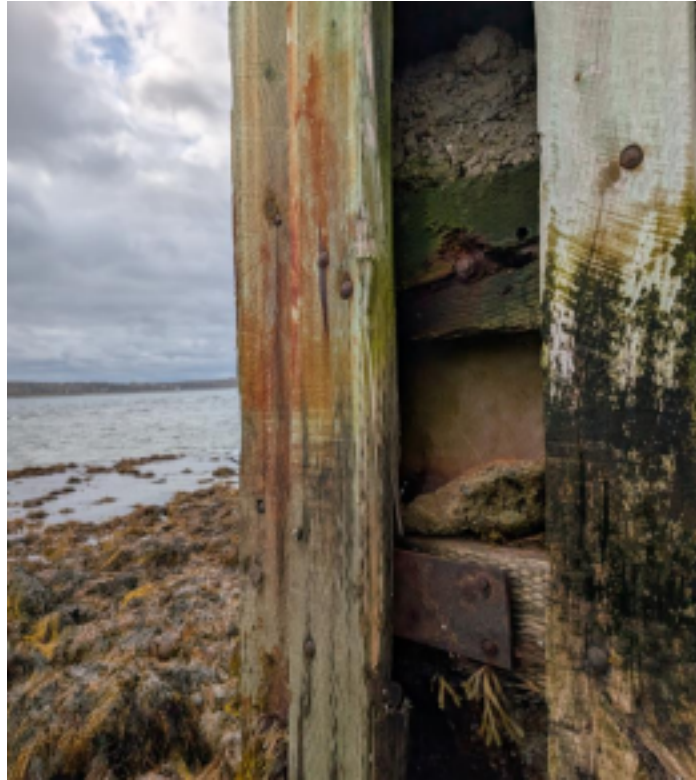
View of the deteriorating and lost timber fenders with the concrete wall behind.
